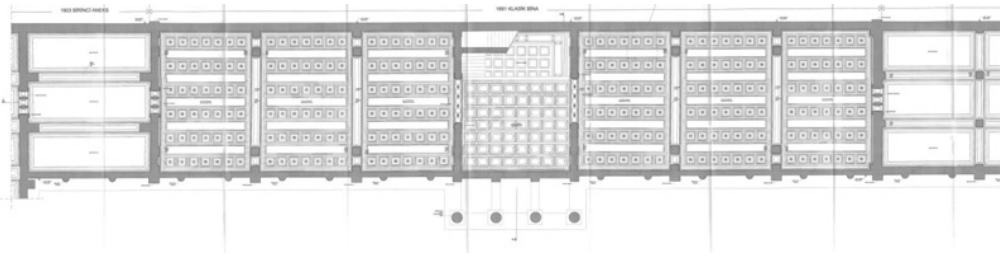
The restitution ceiling plan of ground floor of 1<sup>st</sup> construction phase of IAM, drawn by *Seçkin Mimari Hizmetleri* (source: IDSM Archive)
